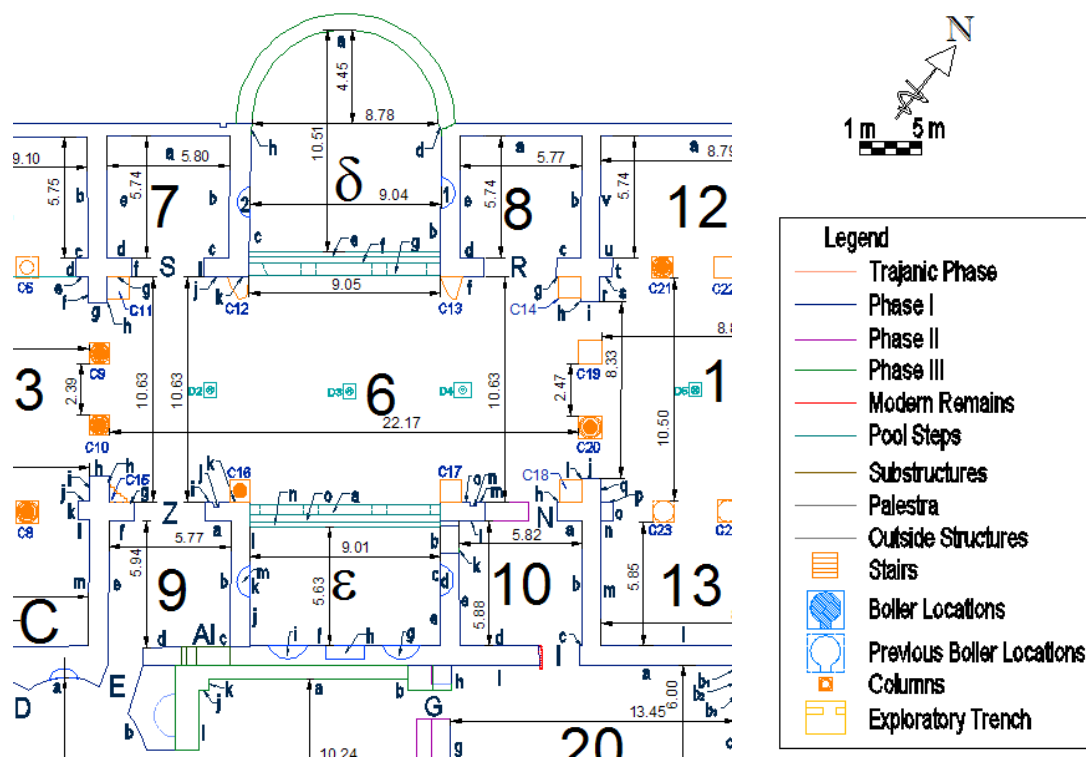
Plan of Rooms 6, 7, 8, 9, and 10
